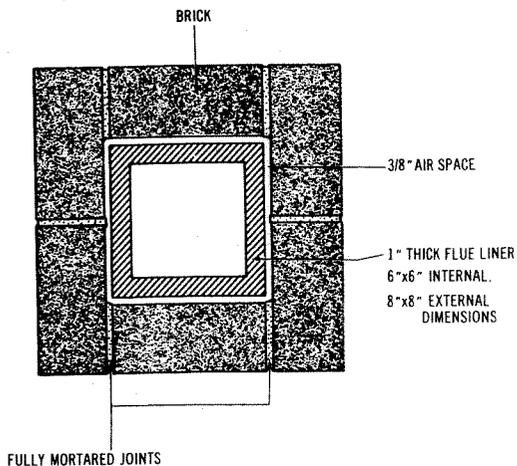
Top view of chimney, showing wall brick, flue liner, and air space between liner and chimney wall.
